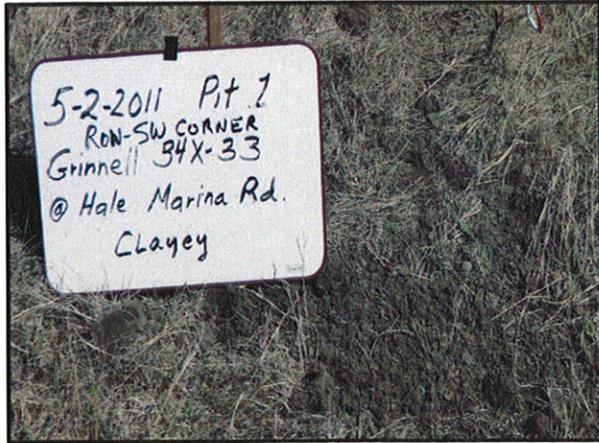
Ecological Site #1 – Clayey. Soil pit on Hale Marina Road ROW.
